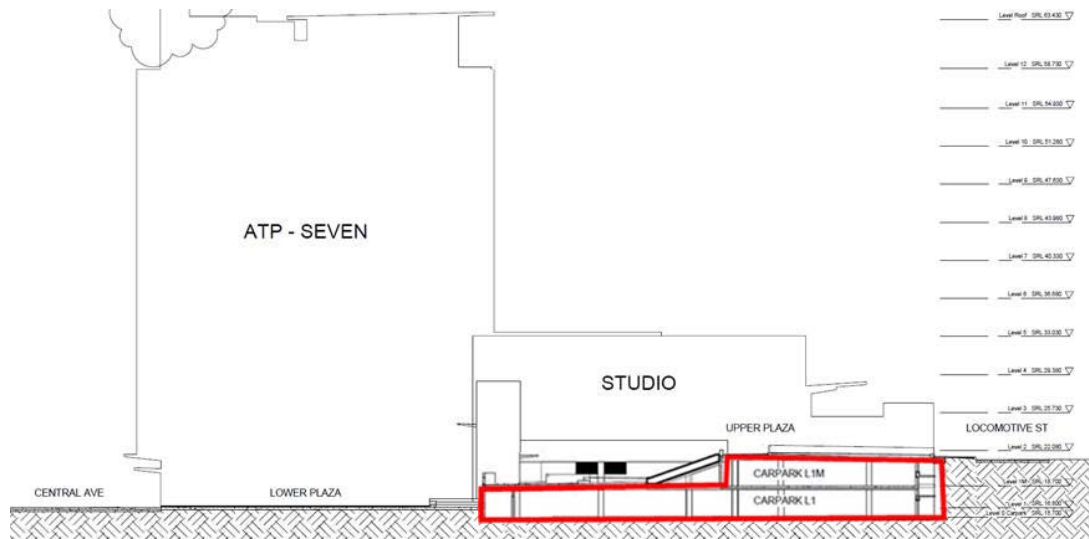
Section through the existing Media City building, showing basement parking below the plaza (red outline)
